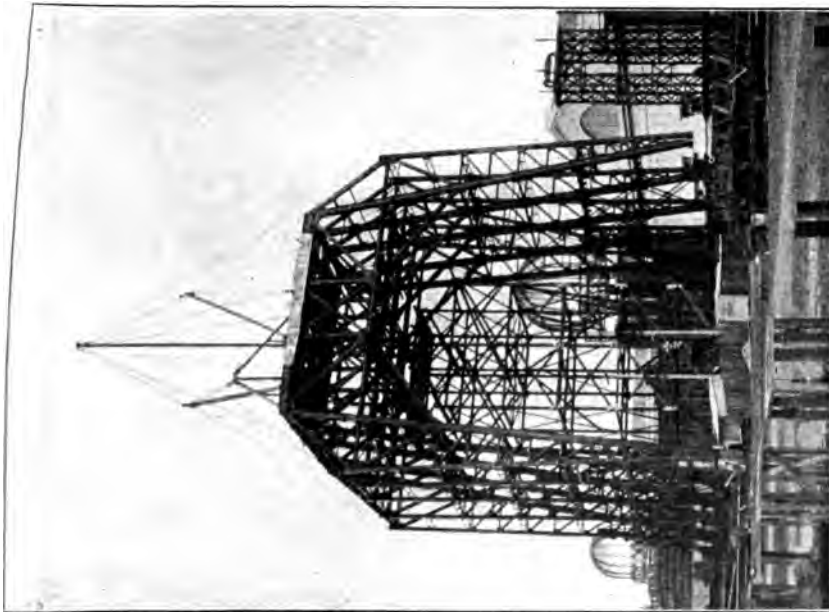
STEEL FRAME OF TOWER OF JEWELS TO
